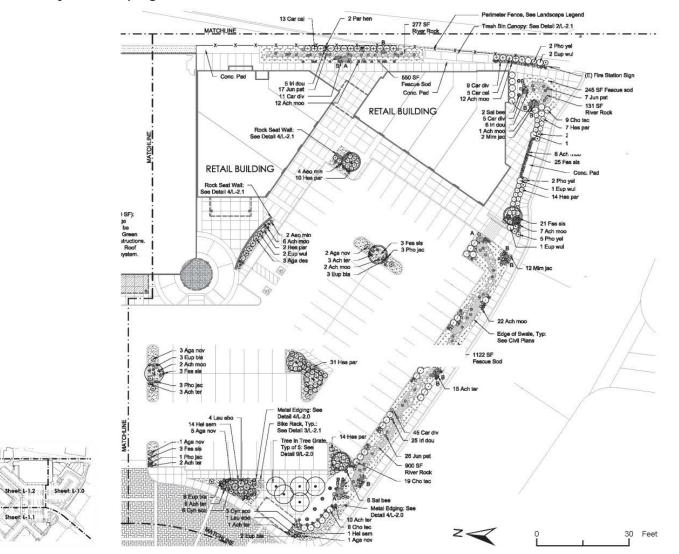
Preliminary Landscaping Plan Sheet L-1.0
